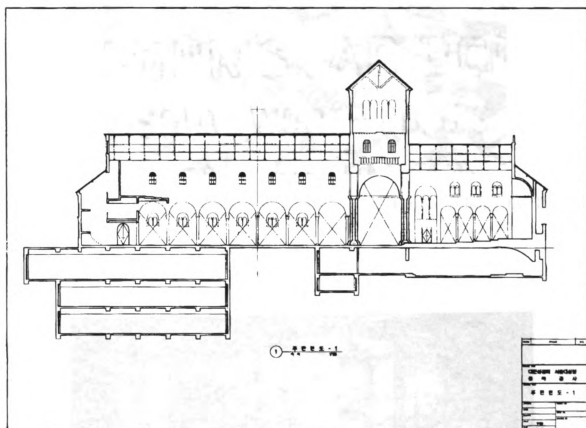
Longitudinal section of proposed Seoul Anglican Cathedral. From a drawing made by Daewoo Construction Co.
